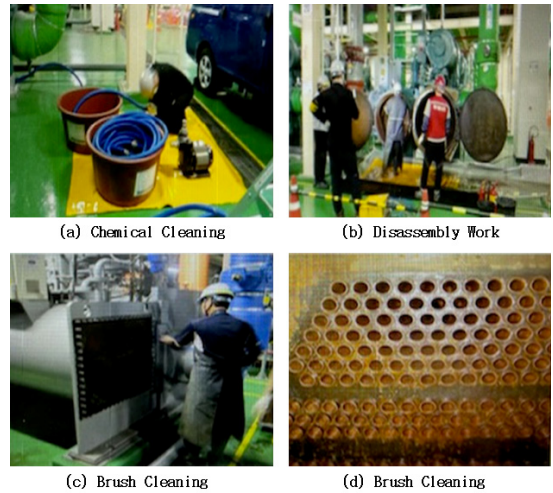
Condenser cleaning process for R-134a turbo-chiller
